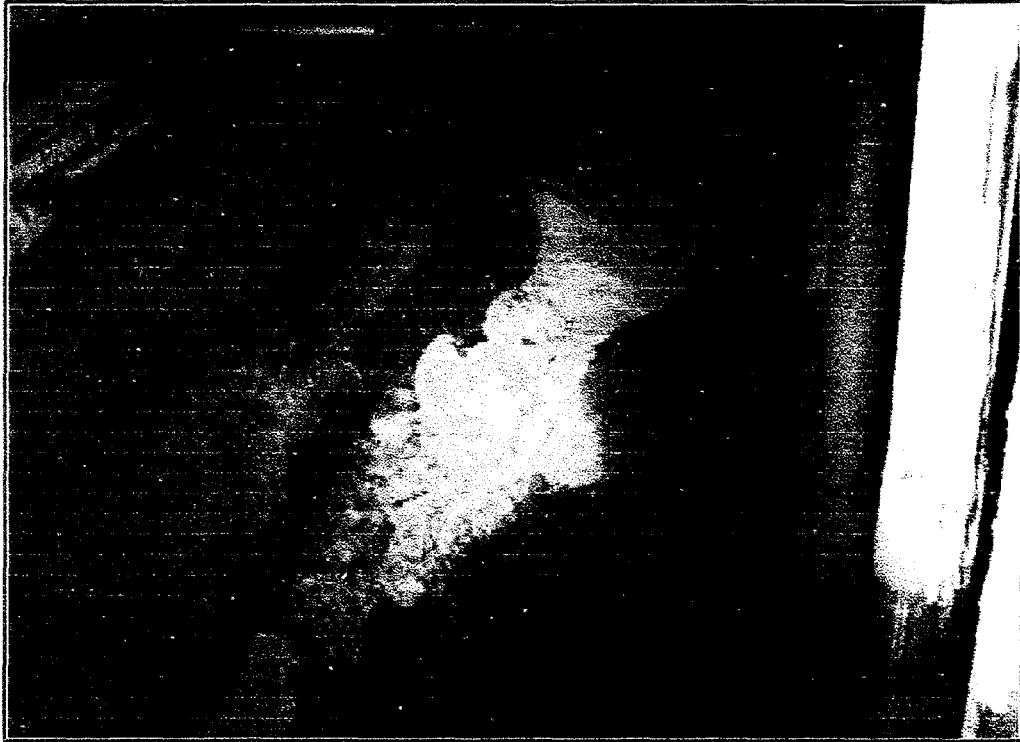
W-21 east wall after Campaign 3 (BVST-0702-3).
